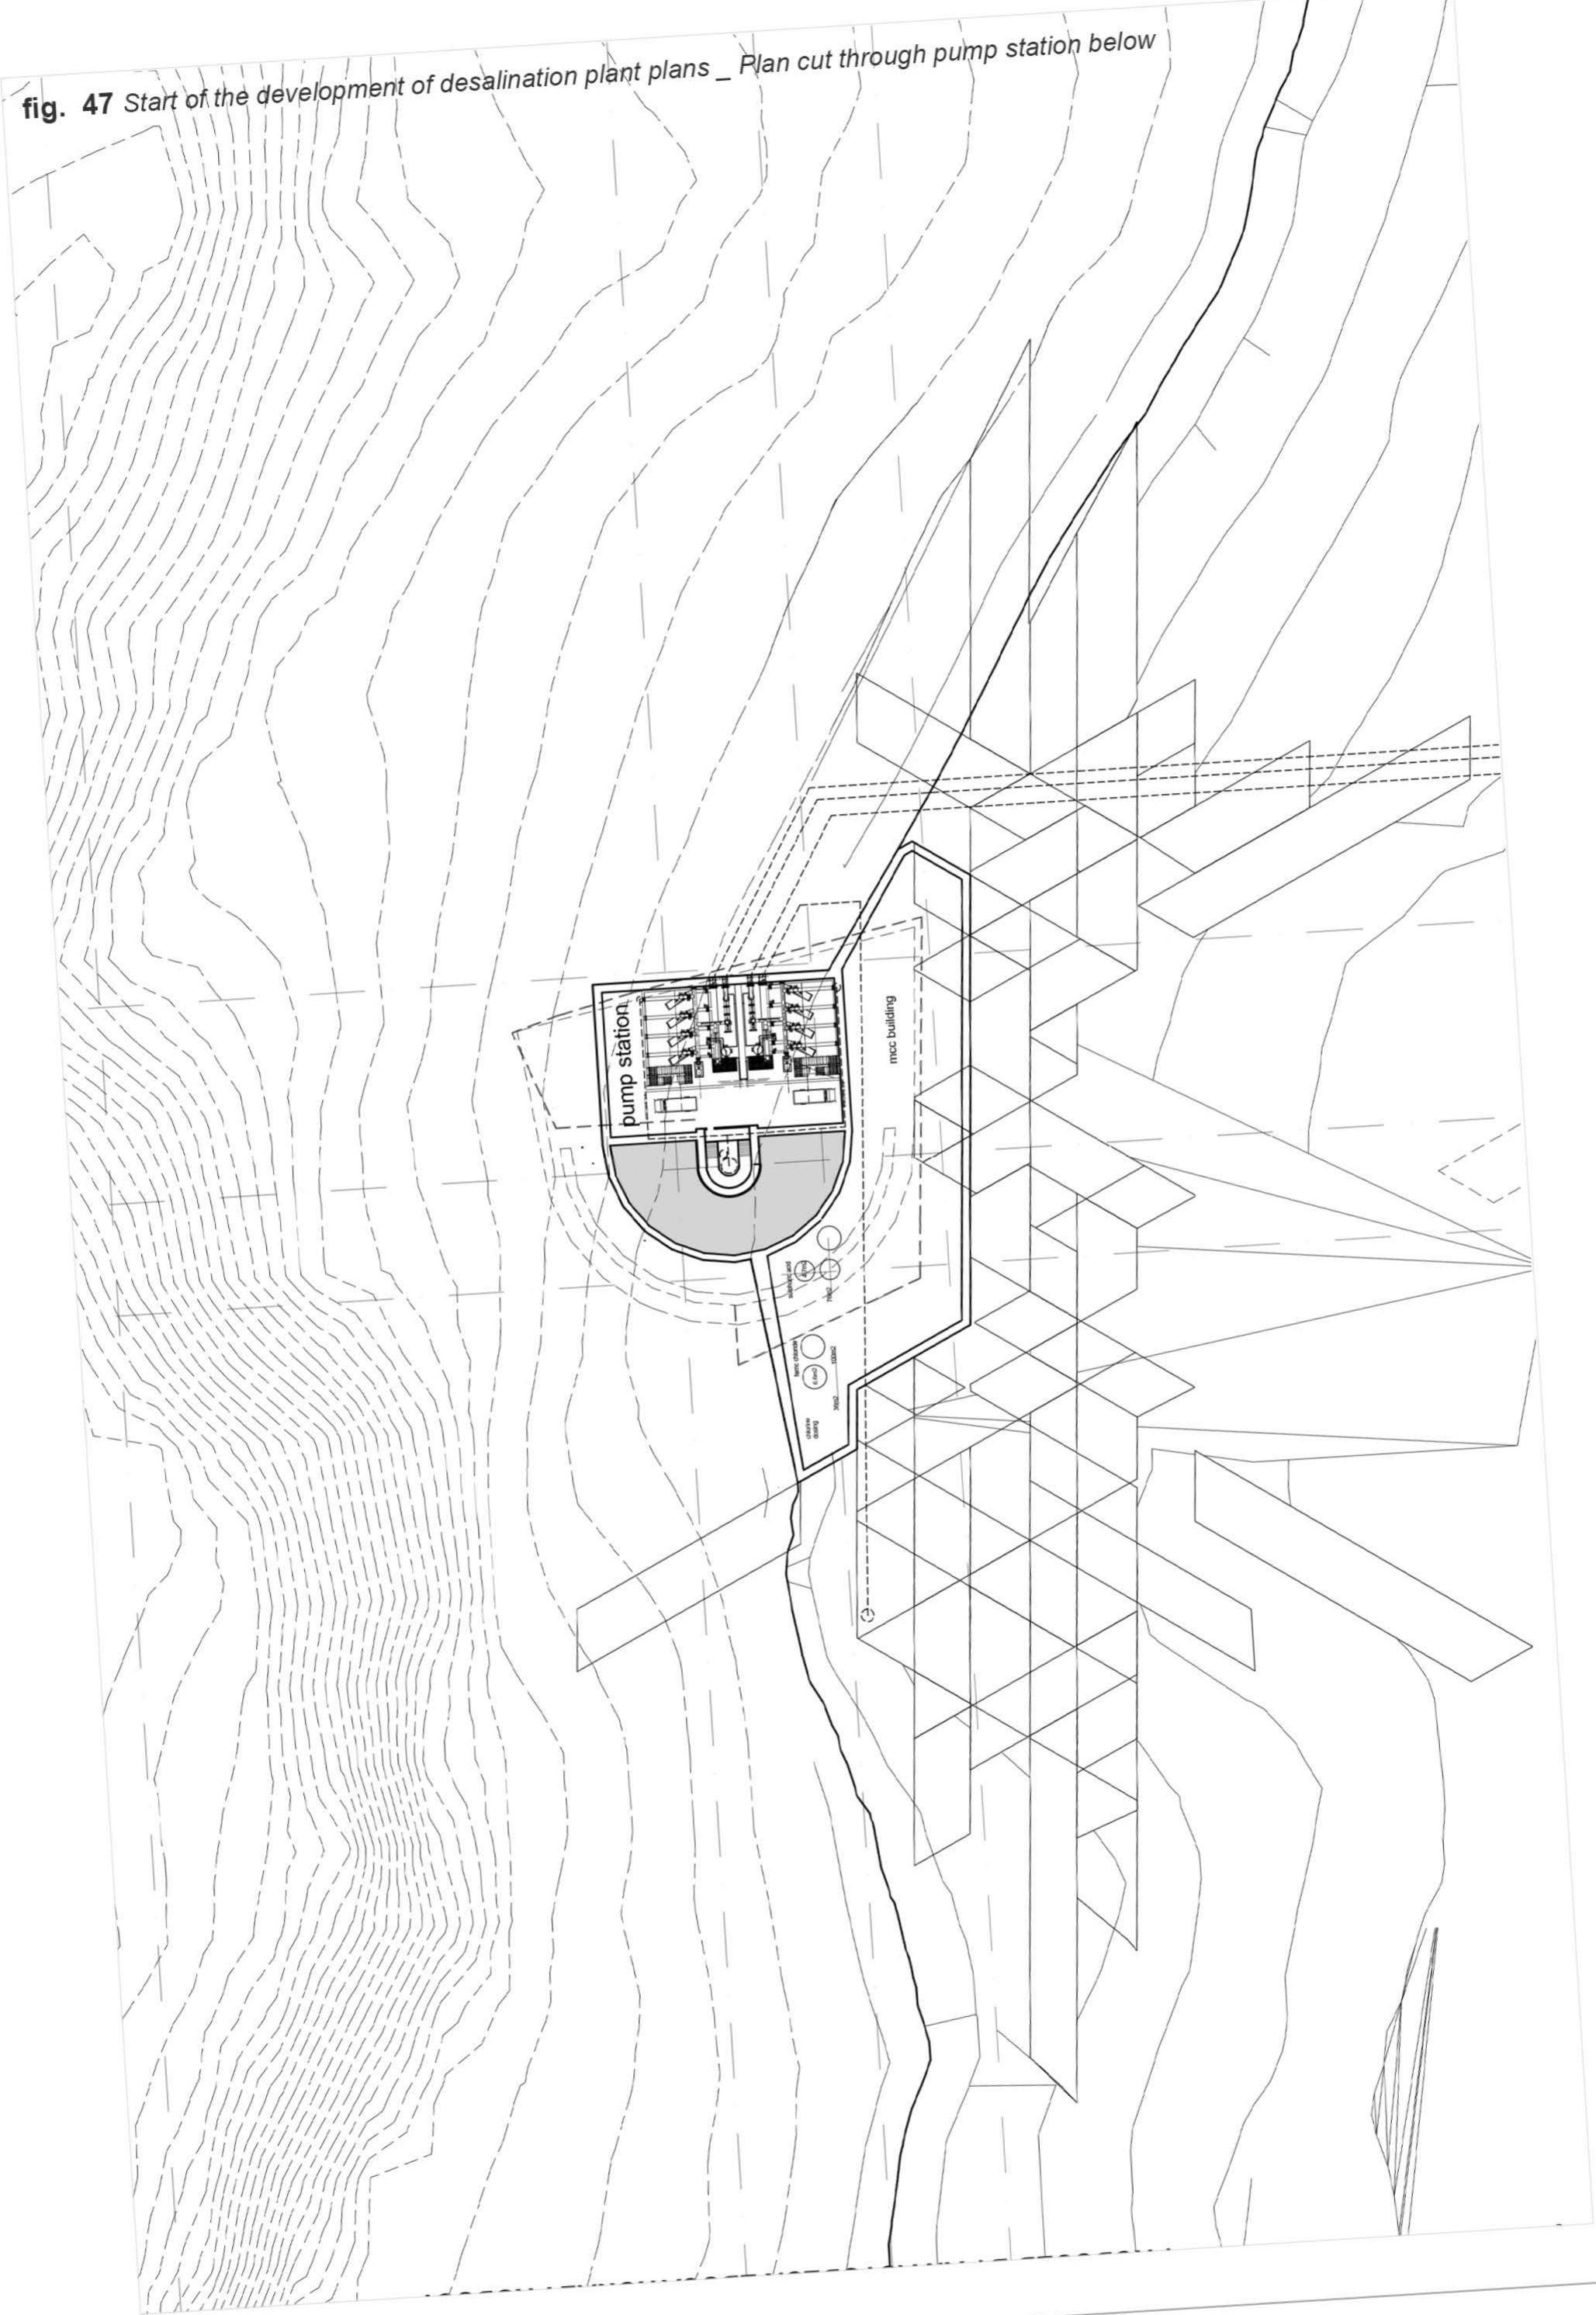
Start of the development of desalination plant plans _ Plan cut through pump station below
